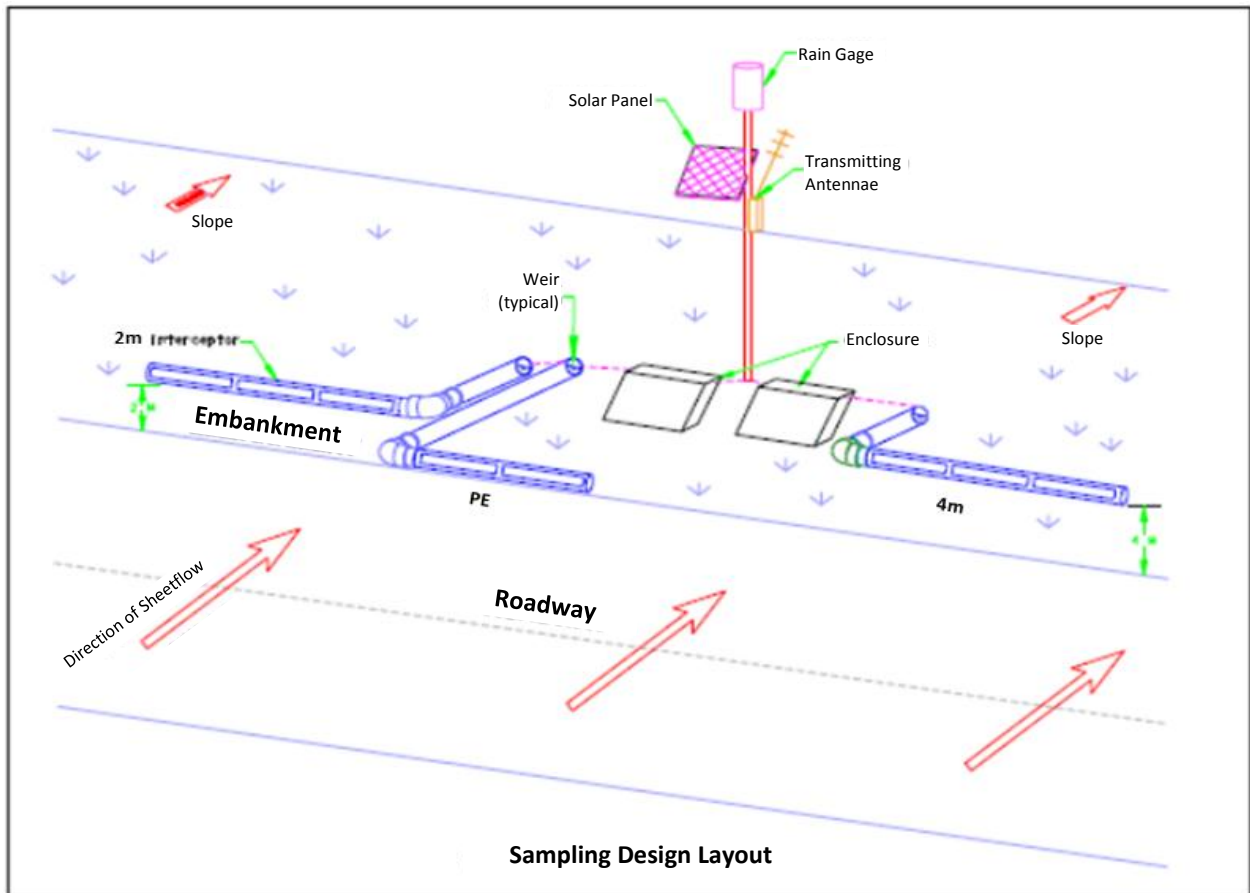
Sampling design layout with PE collector, 2-meter and 4-meter collectors, and sampling equipment.
